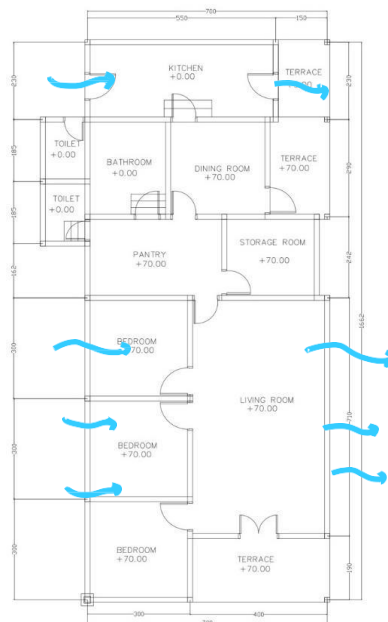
Floor plan of Traditional House and the breeze flow (Author Documentation)
